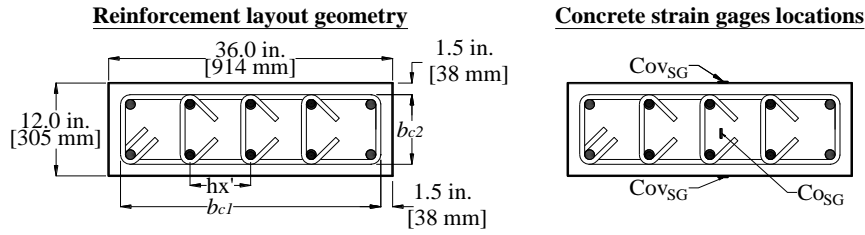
Reinforcement layout and location in plan of core and cover strain gages
